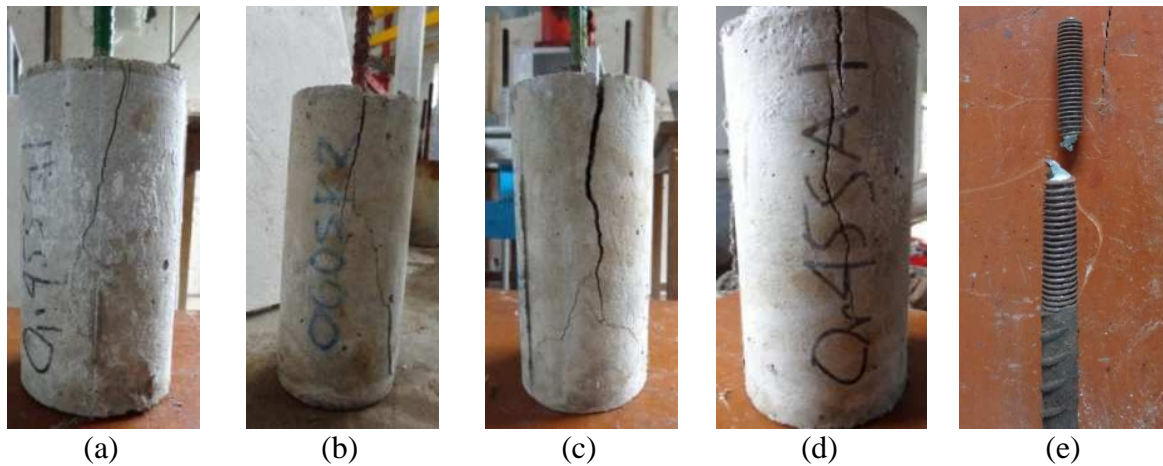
Longitudinal bond fracture of pullout test specimens a) shear failure, b) shear and cone failure, c) split and cone failure, d) columnar failure and e) bar yielding
